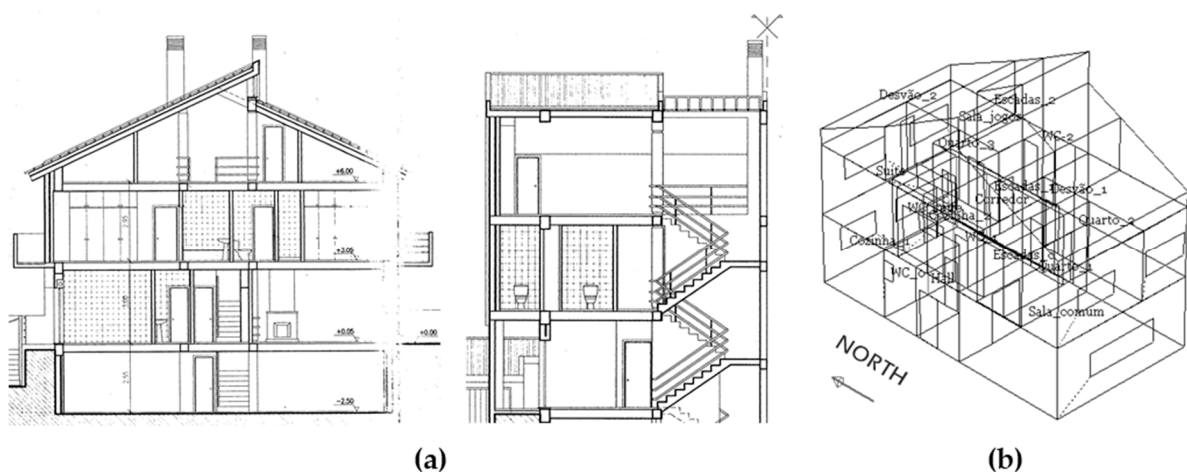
(a) Building sections, and (b) a 3D model of the simulated building.
